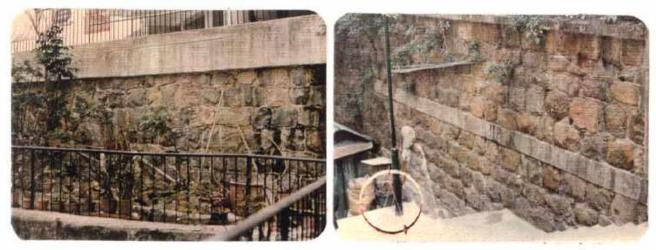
Pointed Squared Rubble Wall (11SW-A/R295)
